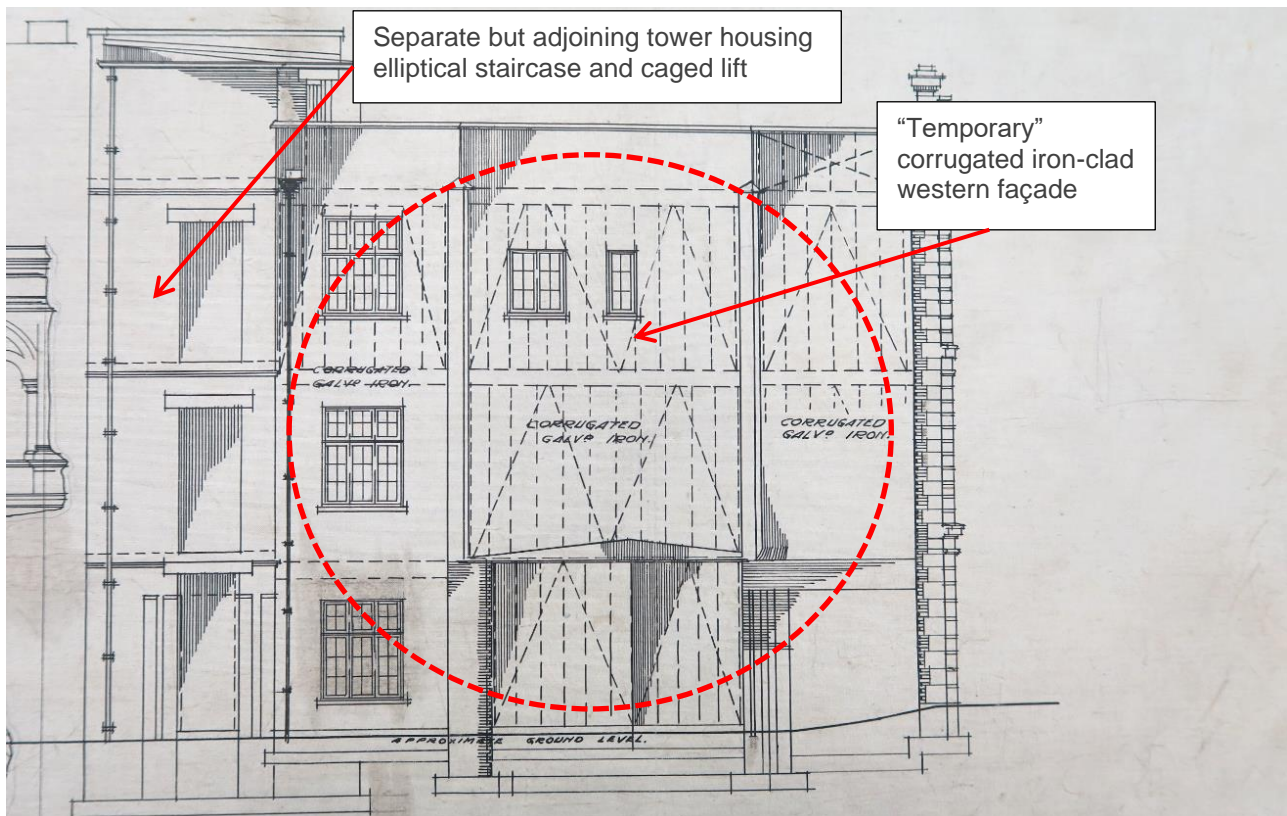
1916 George McRae proposed Plans – Elevation of temporary end (western façade)
